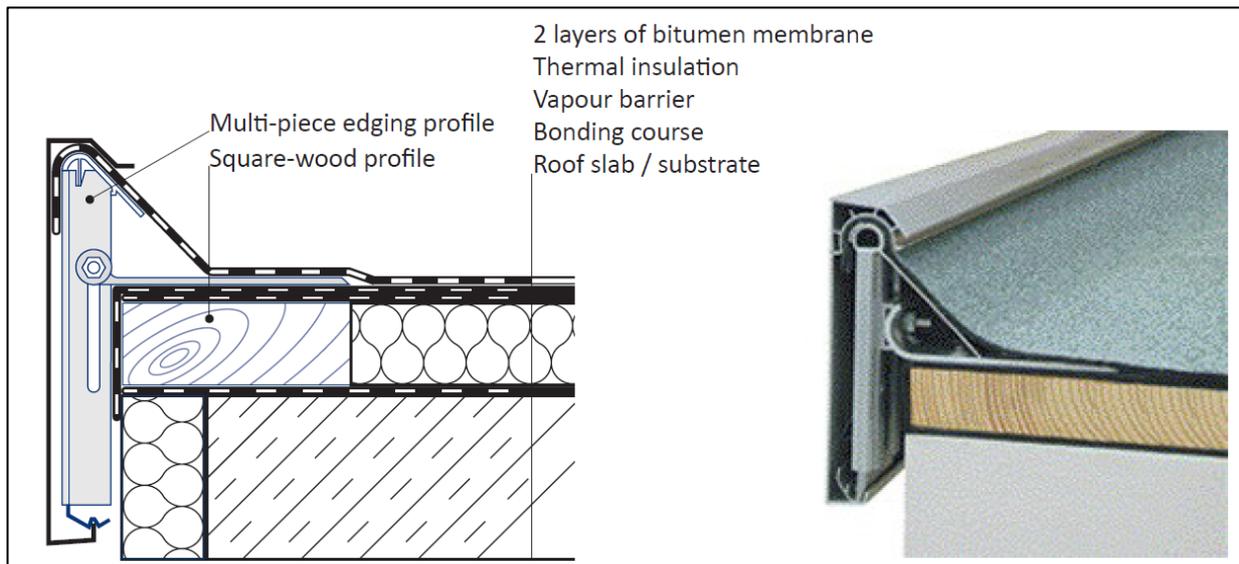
Schematic drawing of a multi-piece edging board profile⁶
